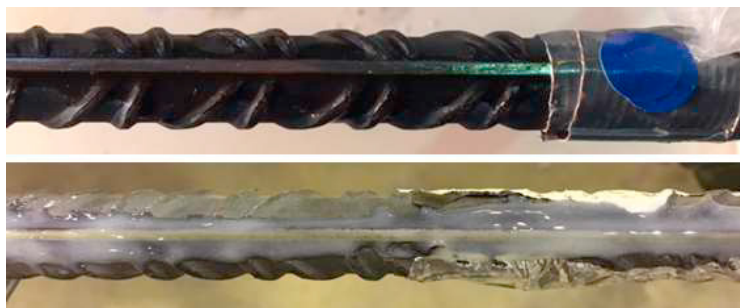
Used cyanoacrylate on beam specimen 1 (top) and two-component epoxy on beam specimen 2 (bottom)
